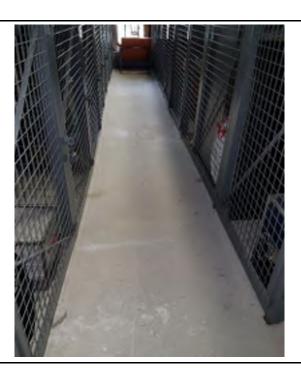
First floor concrete slab in tenant storage space, facing southwest. 27 February 2019.
